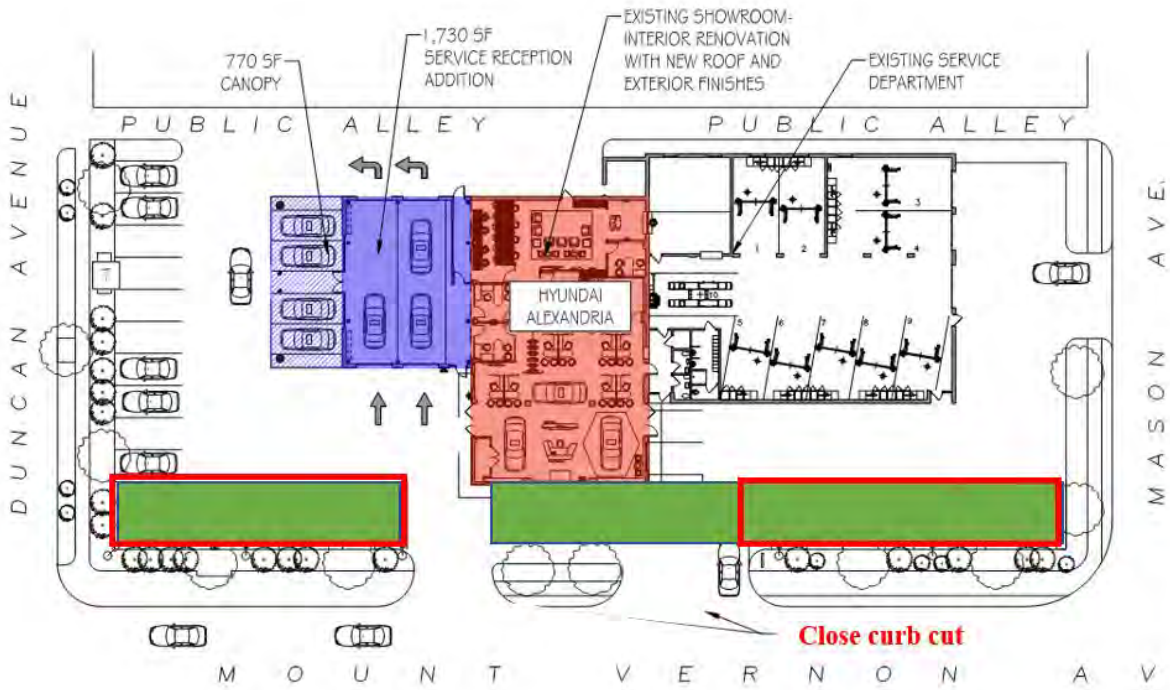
Fifteen parking spaces at 1707-1711 Mount Vernon Avenue, outlined in red, are recommended for removal and for replacement with open space. Approximate areas recommended for open space and landscaping are noted in green. The southernmost curb cut would be closed.
